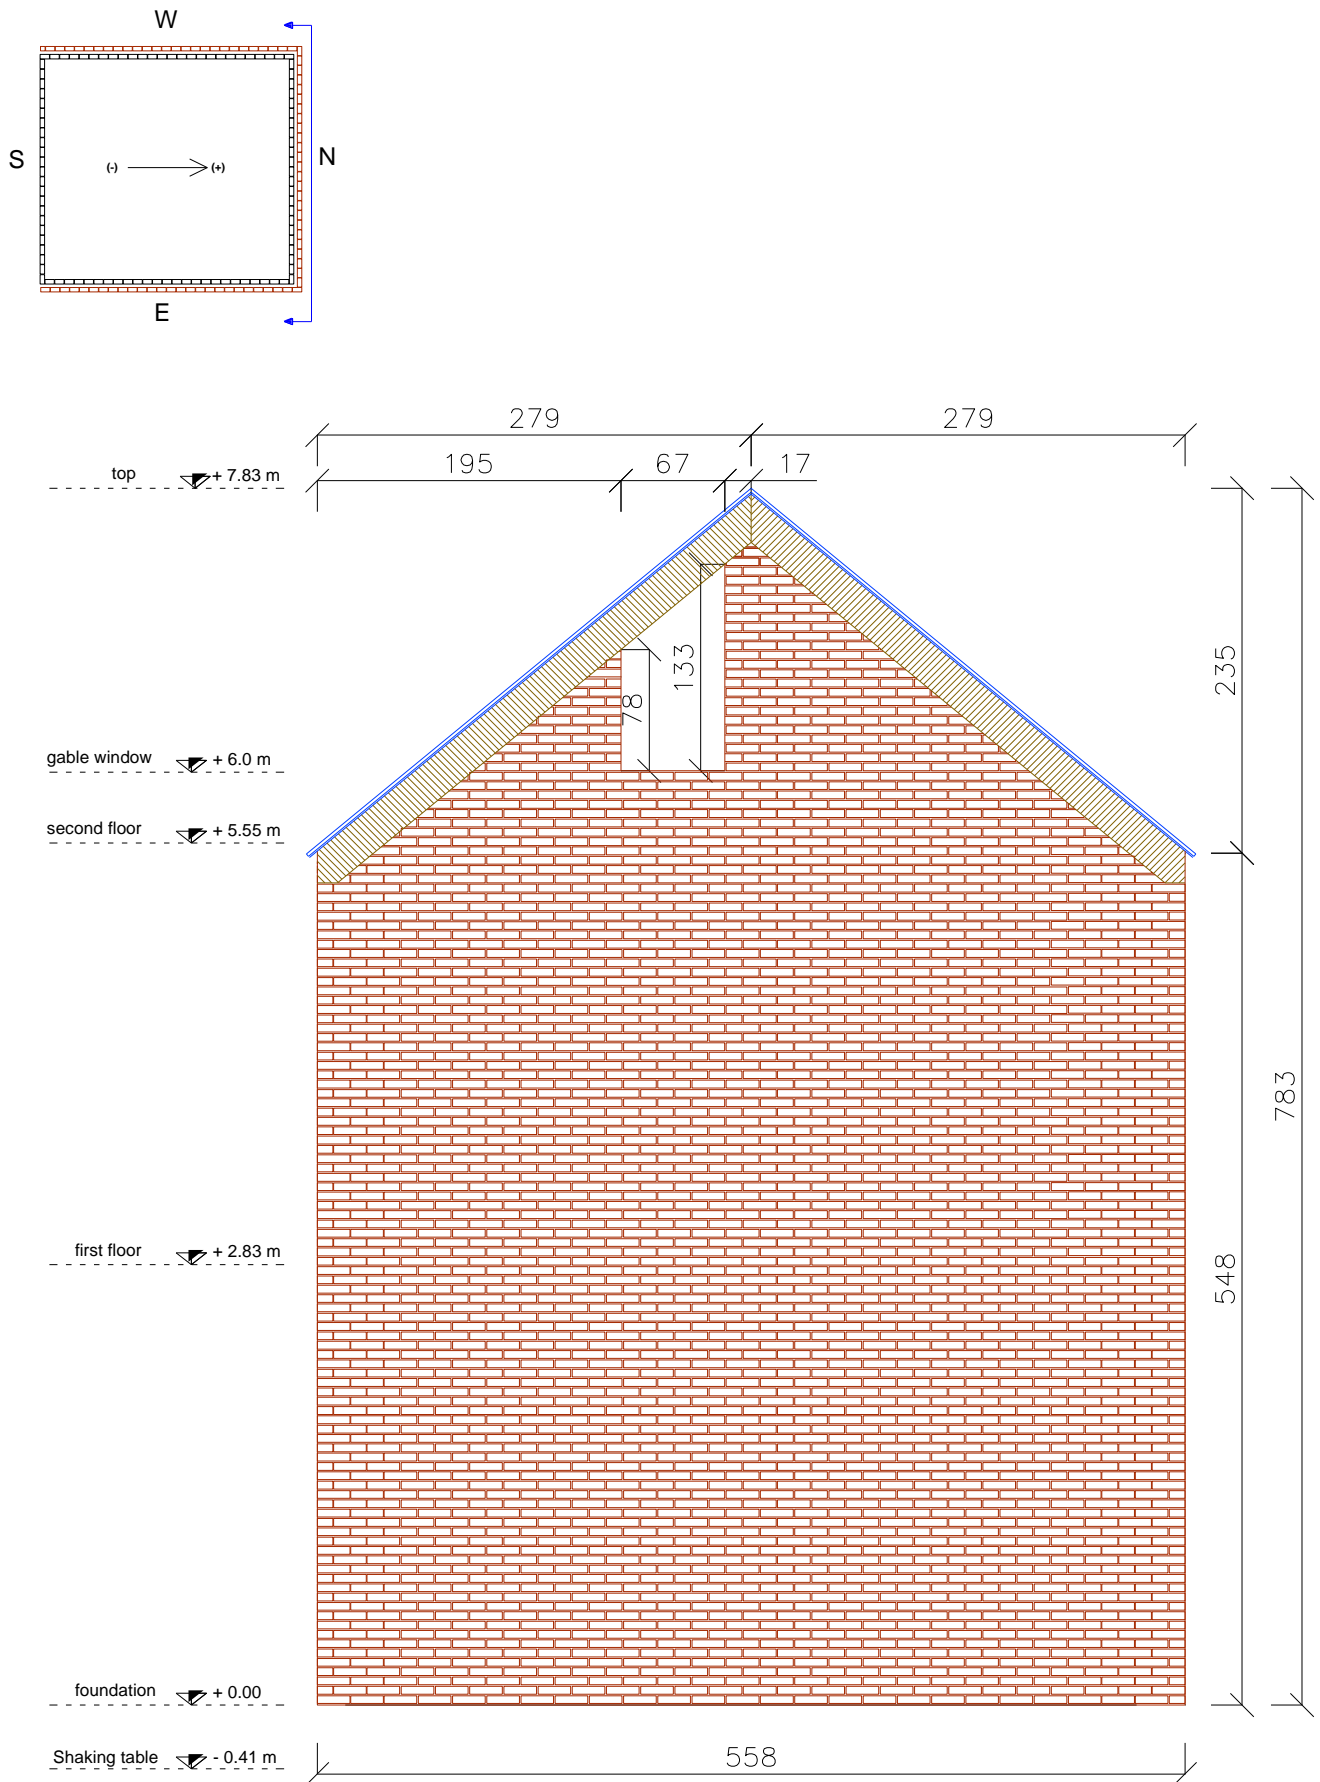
North elevation of the specimen Clay outer leaf. Units of cm.
